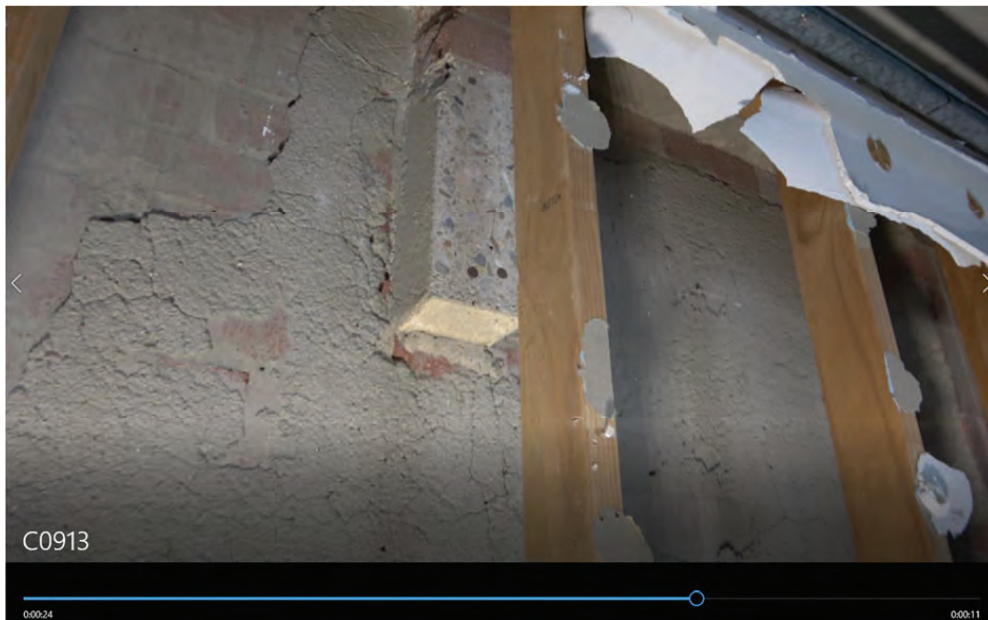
Cut lintel beam with exposed reinforcement at 4-K/M. Typical. Original render is cracked and has fallen off in many places.
